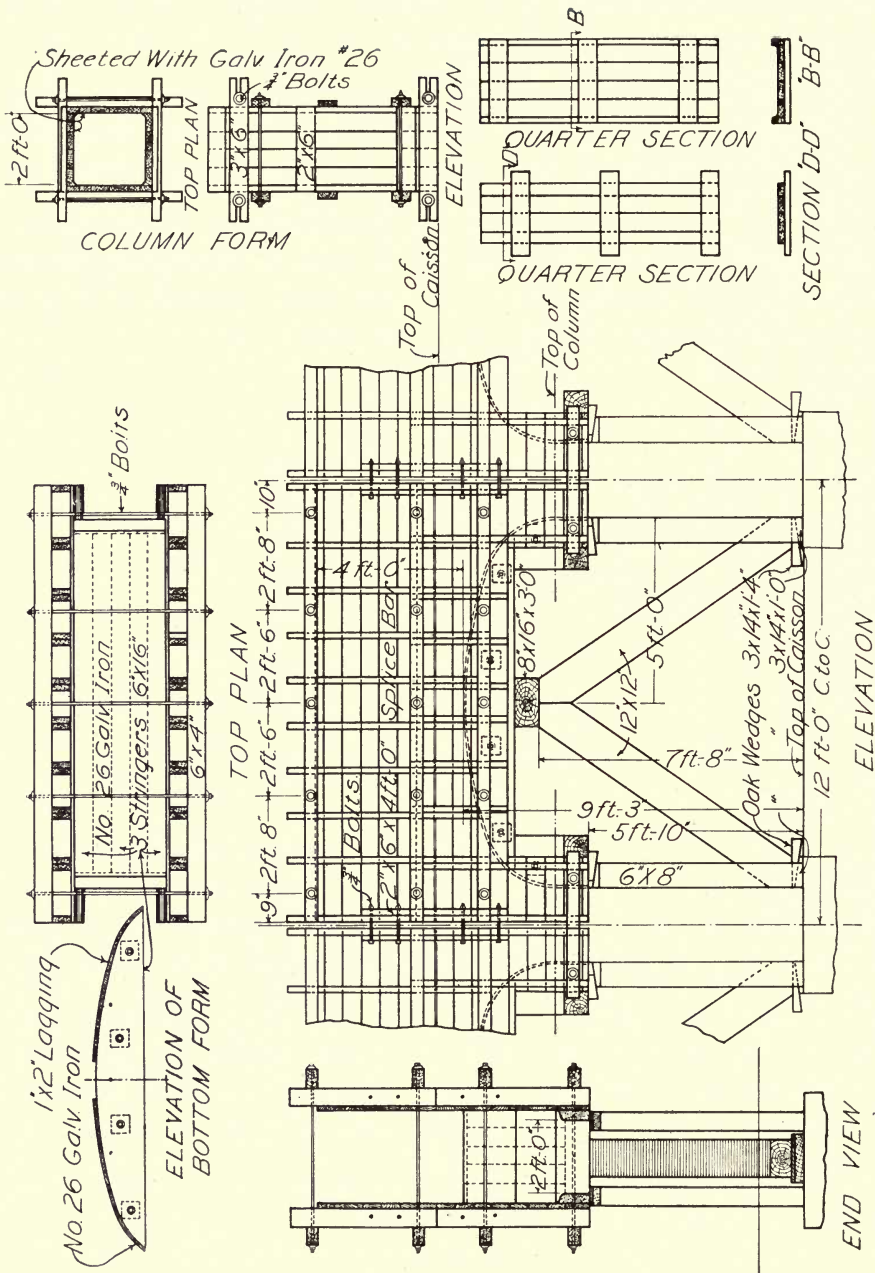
FORMS FOR COLUMNS AND GIRDERS, C., B. & O. R. R. TRACK ELEVATION.
